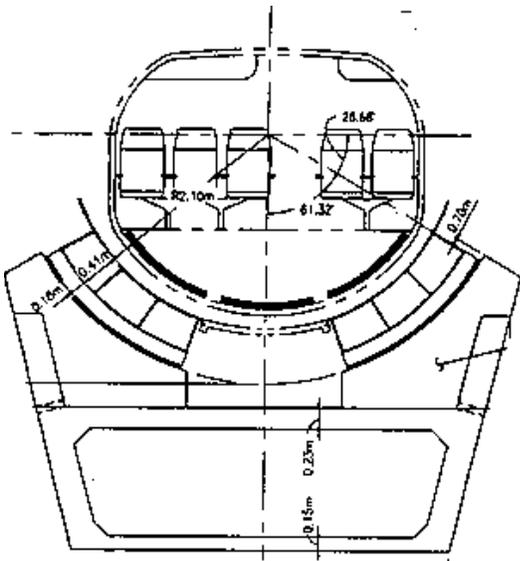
Cross-section of vehicle, reinforced aluminum guideway and auxiliary long-span pre-tensioned concrete beam support
